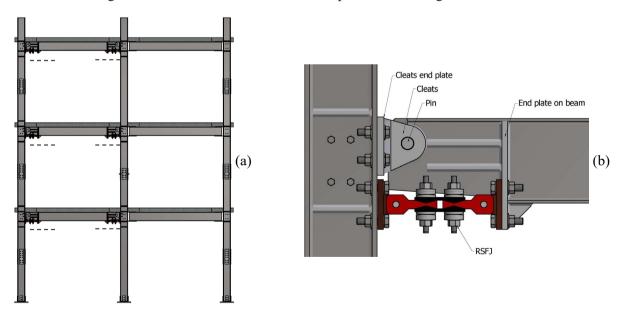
(a) Locations of the RSFJs shown by dash-line in the MRF concept and (b) connection details
